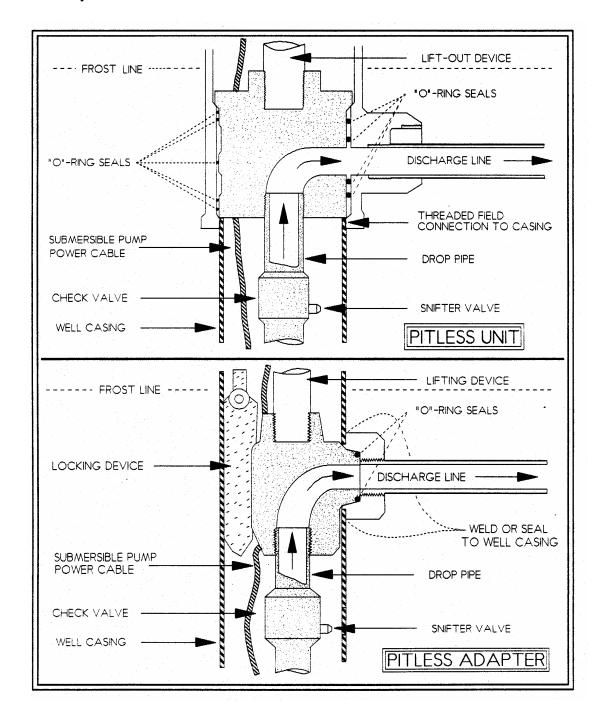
Design of Typical Pitless Unit and Pitless Adapter.
